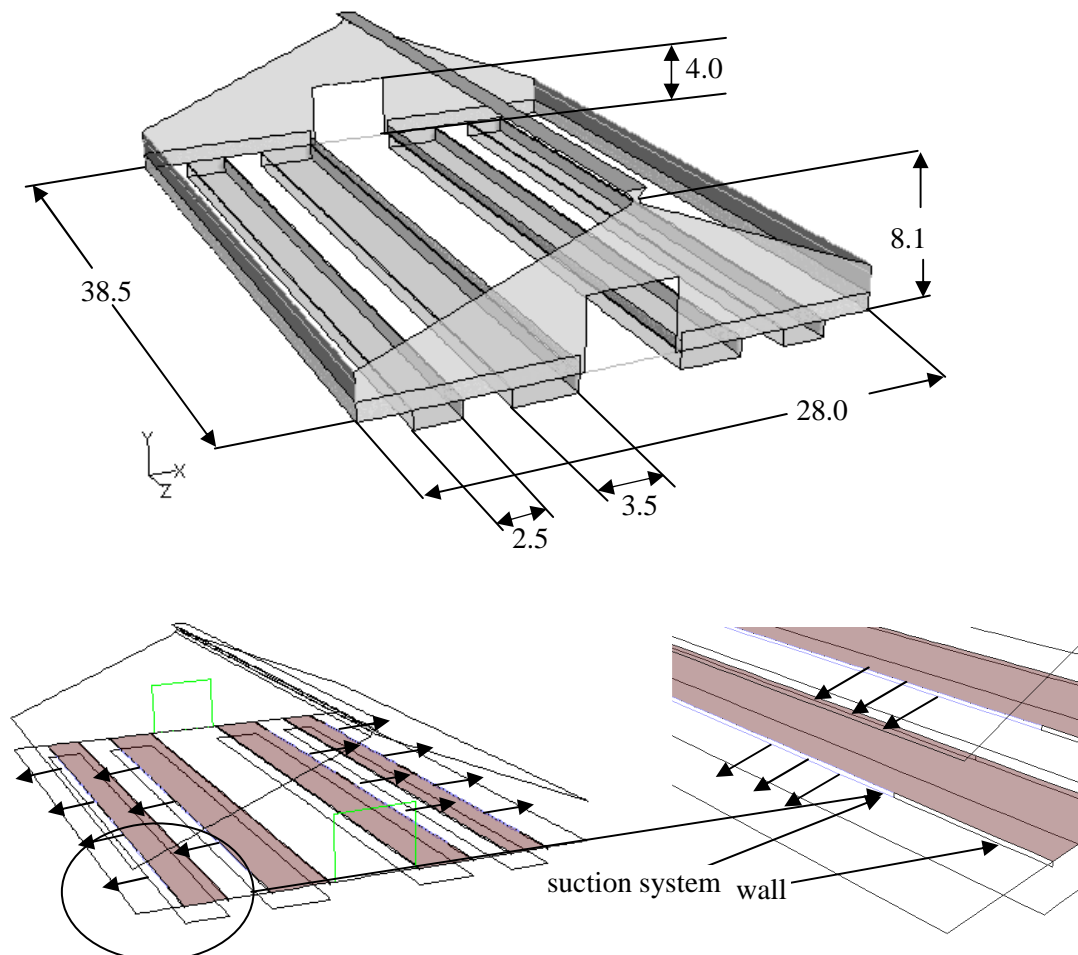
Geometrical design of the dairy cow building with the forced pit ventilation system and dimensions (m) of the main structural components
